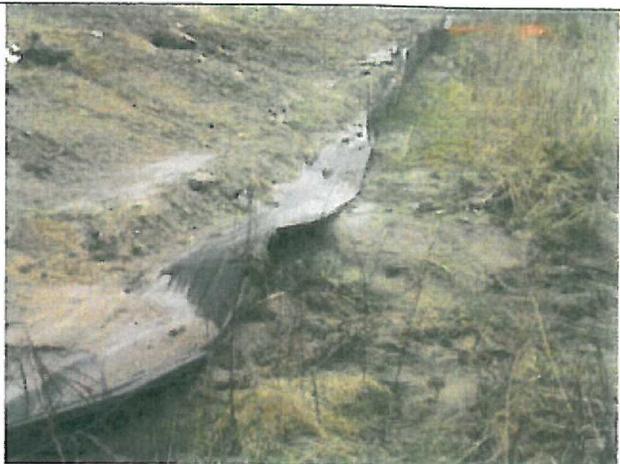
Failing silt fence was located west of the “Potential Additional Borrow Area 1.”
